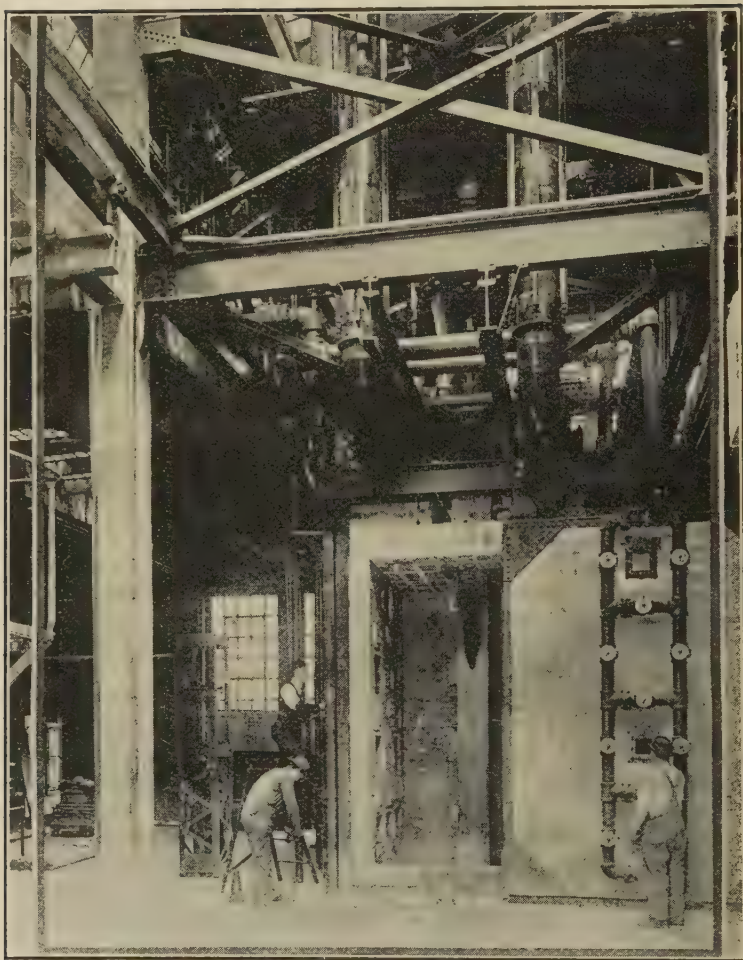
VIEW OF COLUMN TESTING EQUIPMENT USED IN MAKING FIRE TESTS ON BUILDING COLUMNS AT UNDERWRITERS' LABORATORIES. FURNACE WITH SAMPLE INSTALLED AND ABOVE IT THE HYDRAULIC CYLINDER FOR LOADING.
